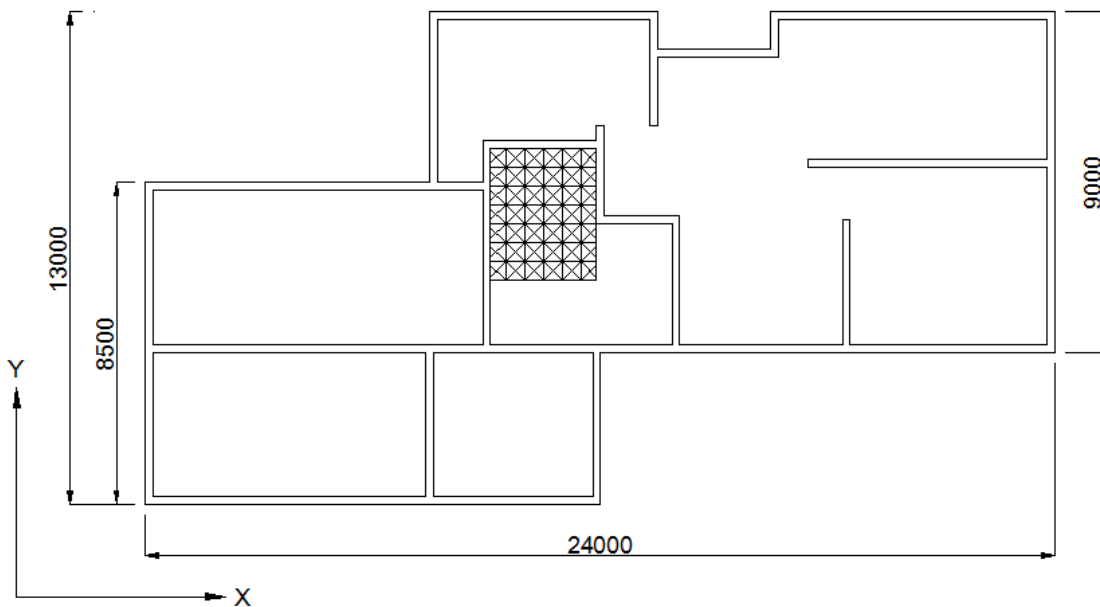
Case no. 2 - The ground plan showing the layout of the wall system.
